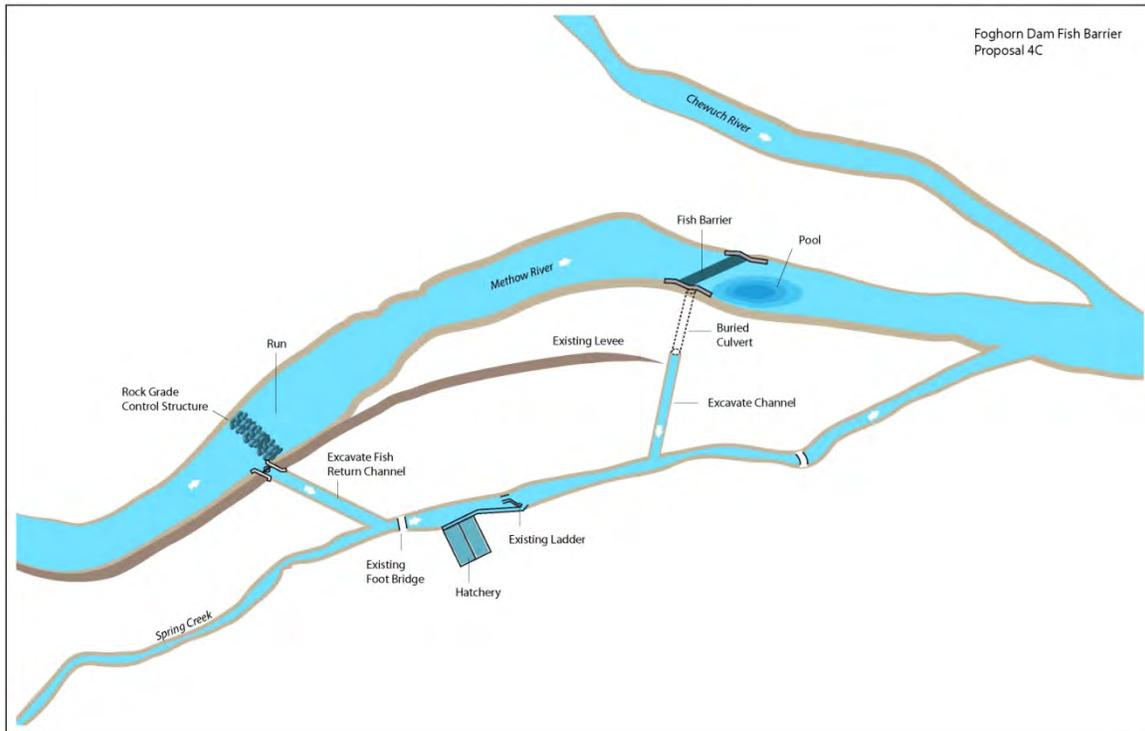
Illustration of Proposal 4 locating a new fixed picket style barrier downstream from Foghorn Dam.
